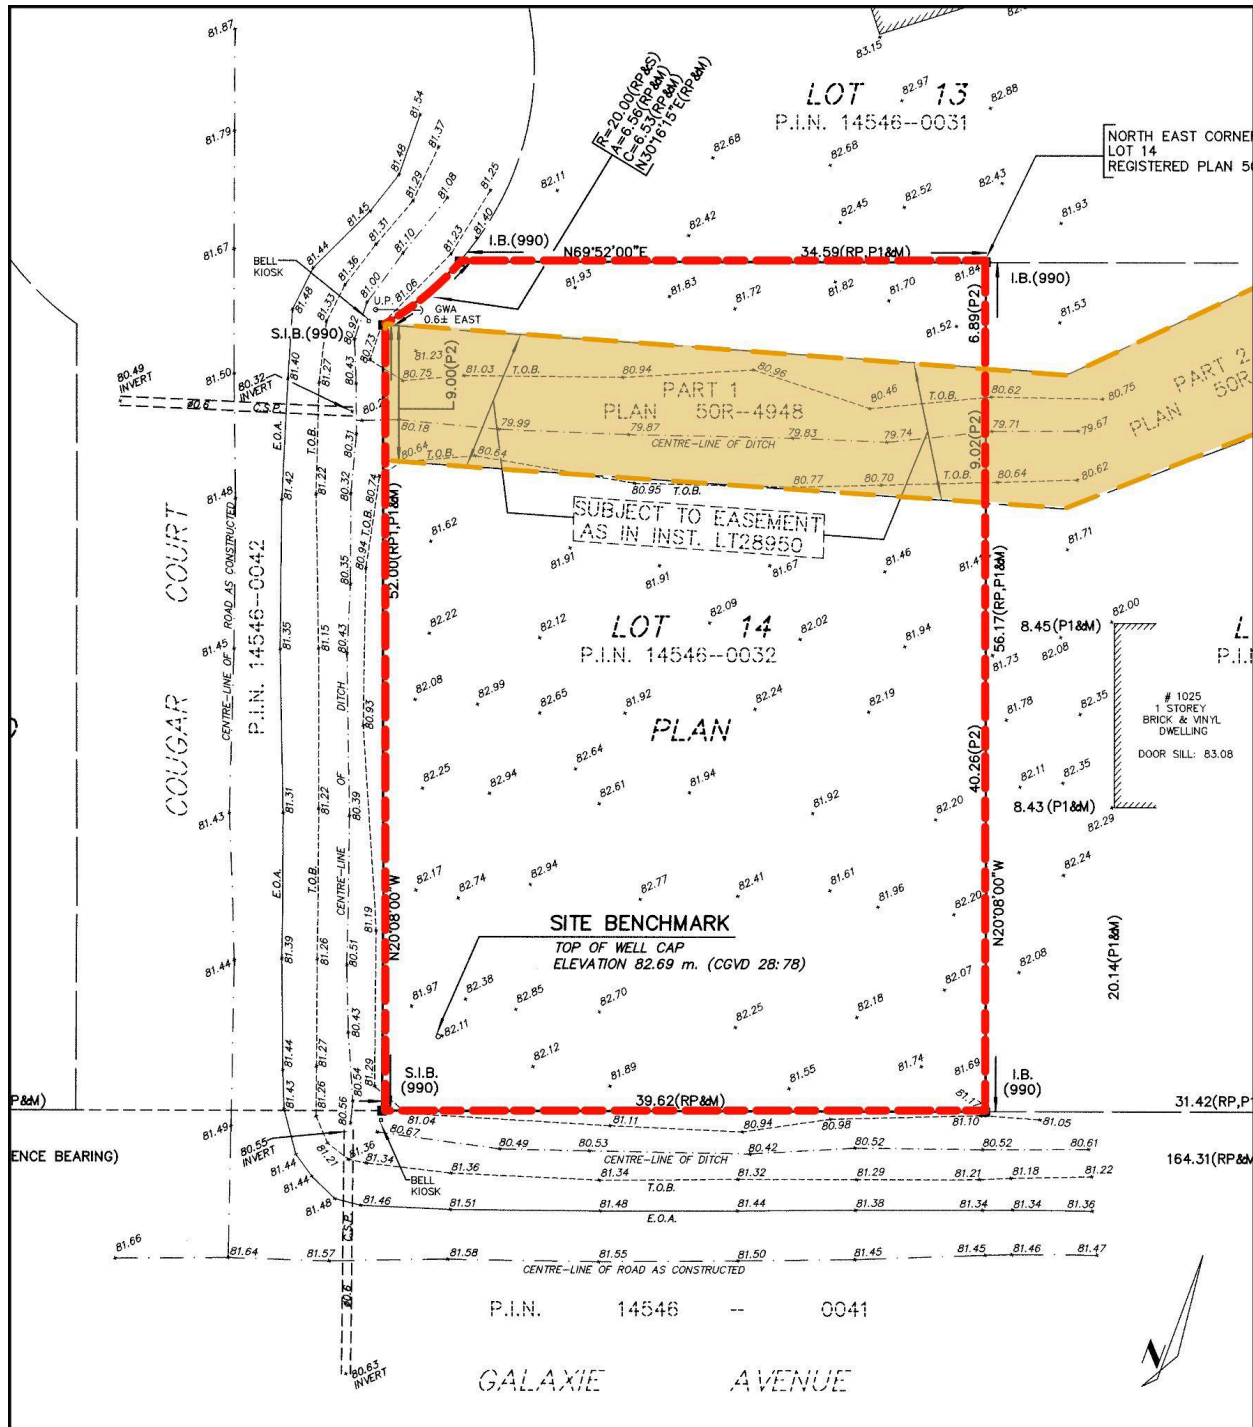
Survey plan of the subject property showing the property boundary and the existing easement containing the drainage ditch.
